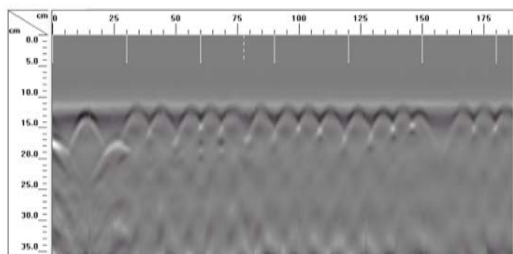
Profile radar indicating the position of the reinforcements in a reinforced concrete wall (Radon 7)
